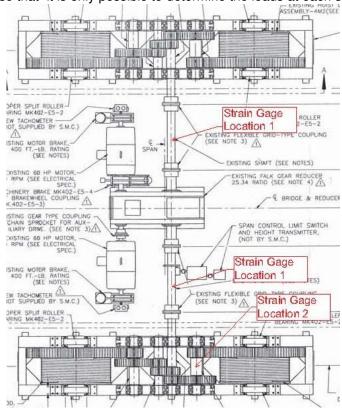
Span Drive Machinery Arrangement. View of strain gage installation locations.
